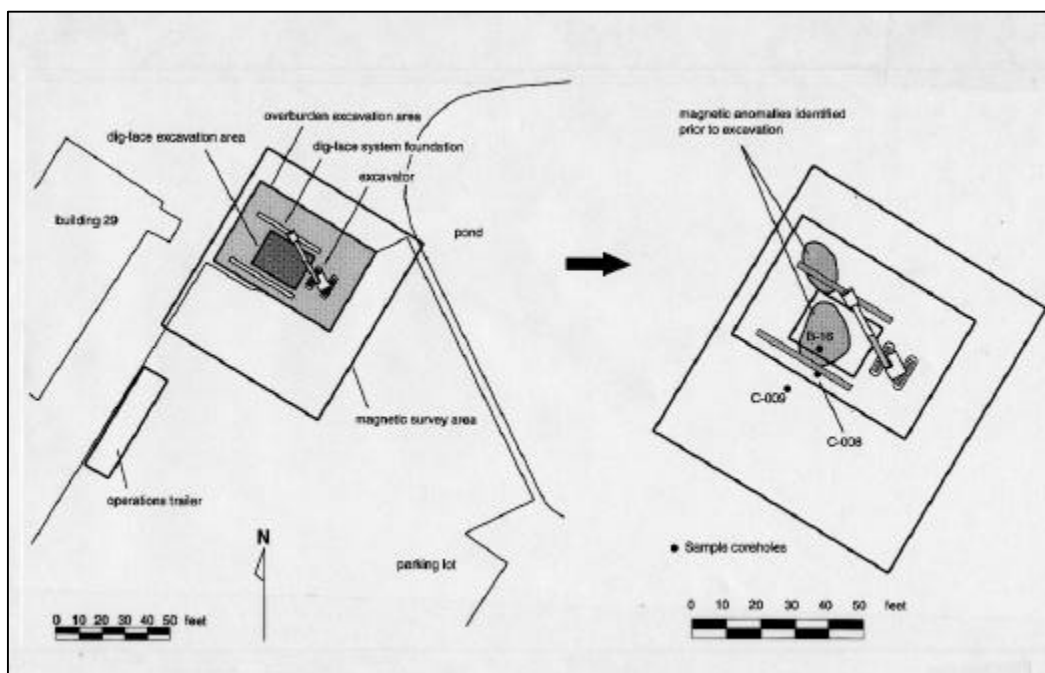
Drawing of the site layout for the Area 7 excavation (left) and detail of the excavation (right)
